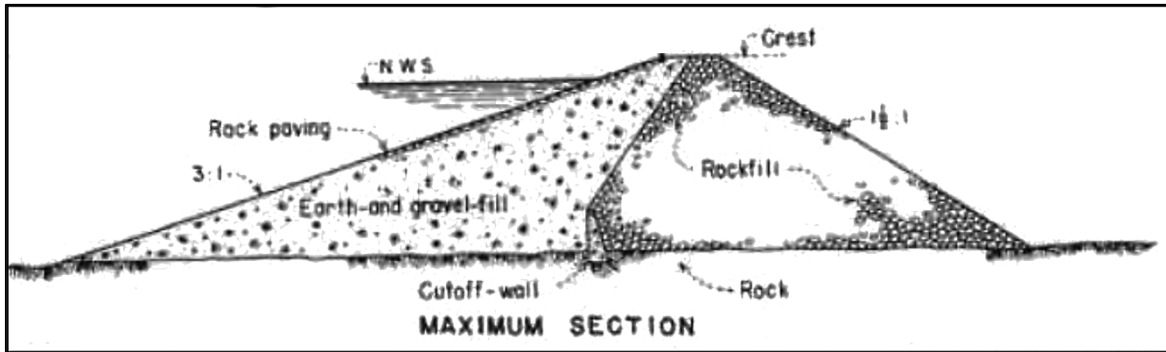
Maximum section of Minidoka Dam. The downstream rockfill zone withstood significant flows when the core overtopped during construction.
